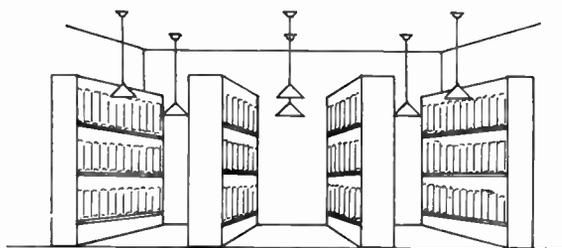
How PENDANT LIGHTS SHOULD BE ARRANGED FOR ILLUMINATING BOOKSHELVES.
